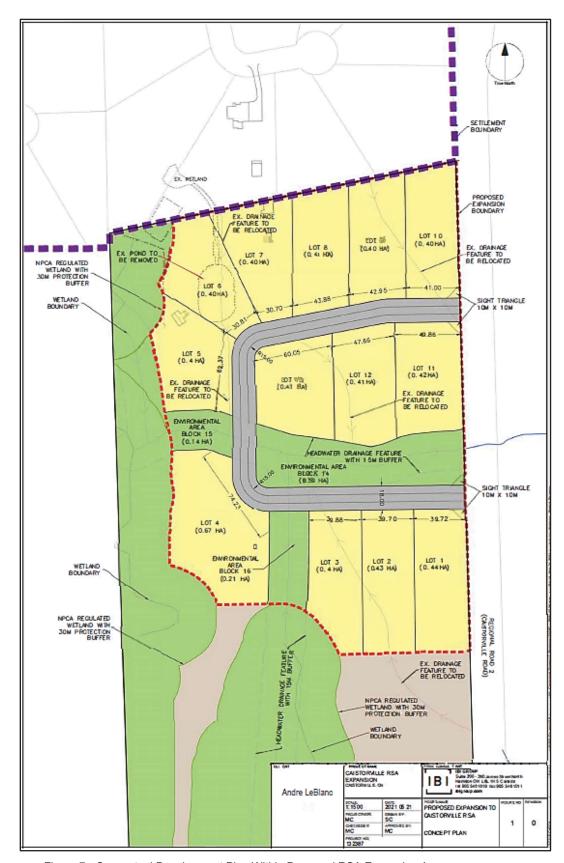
Conceptual Development Plan Within Proposed RSA Expansion Area
